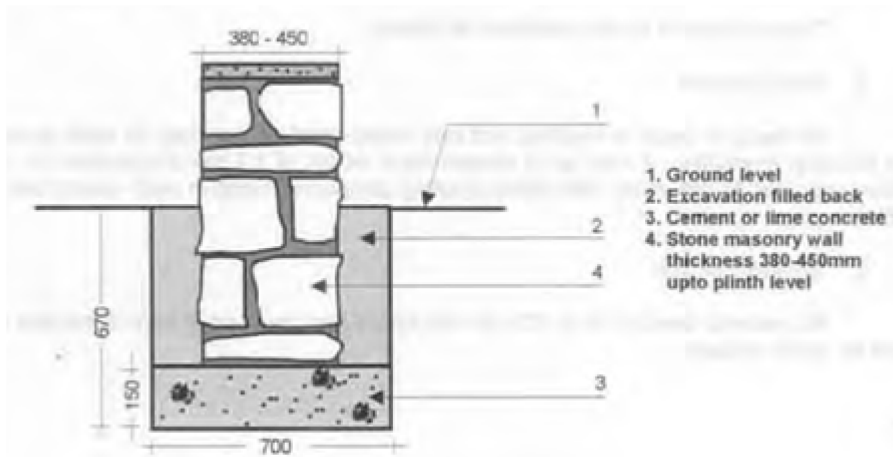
Strip Foundation (Guidelines for Earthquake Resistant Design, Construction, and Retrofitting of Buildings in Afghanistan, 2003)
